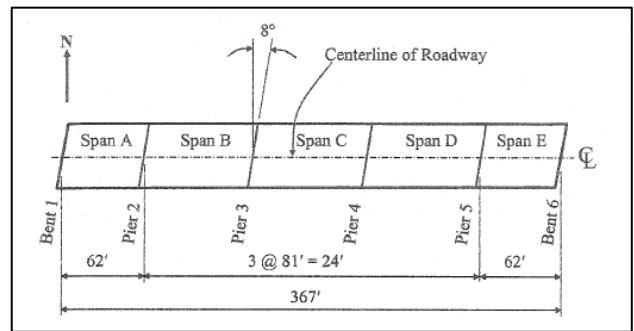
Plan view of SR-18 Bridge (Chovichien, 2004)
